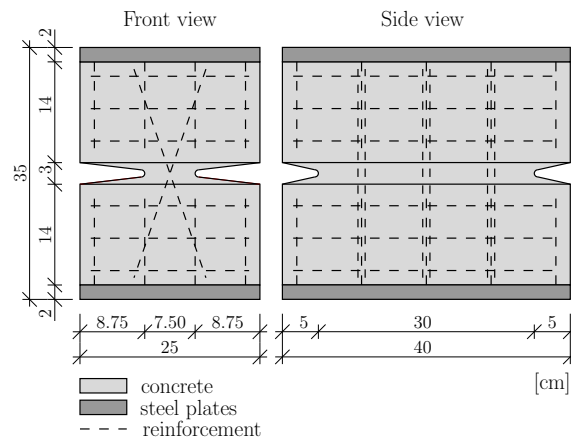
Geometric dimensions of the tested concrete hinges and arrangement of steel reinforcements; after [24]
